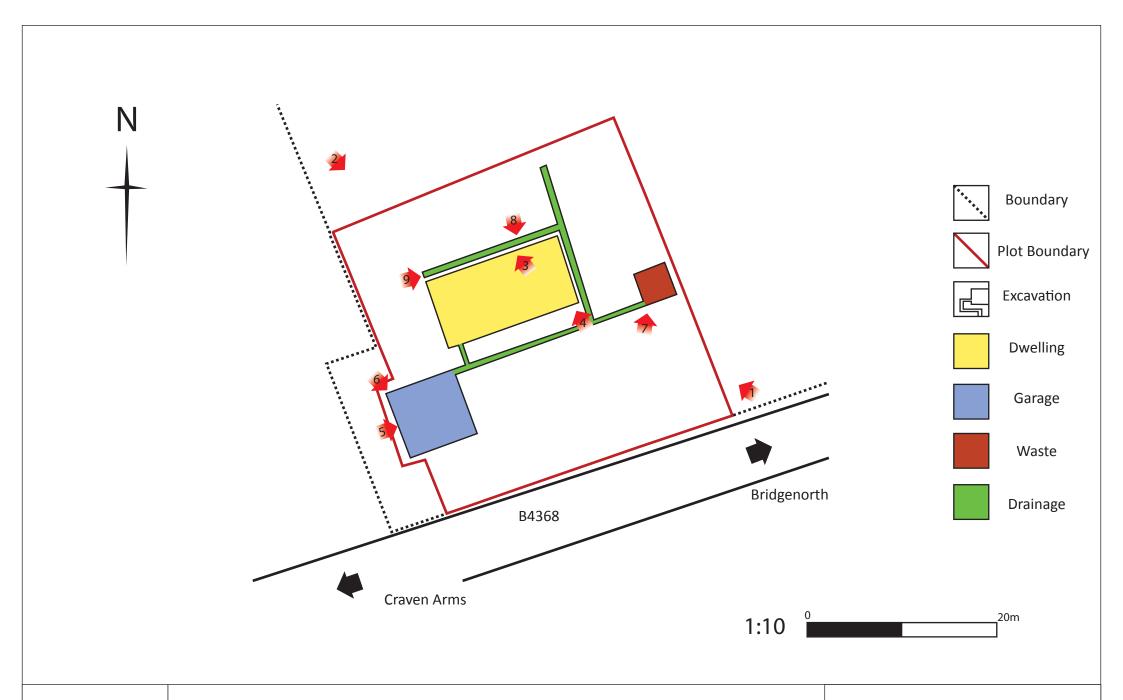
Site plan with location of plates - scale @ 1:400 on A4
